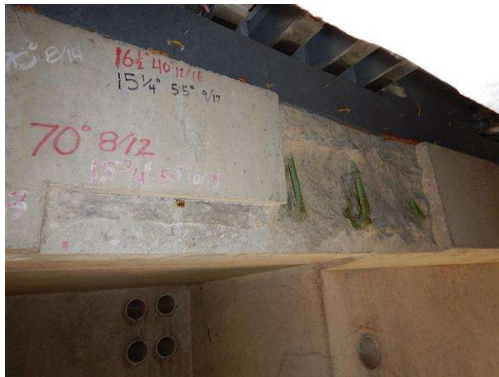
Spalls with exposed reinforcement at the expansion joint at Pier 26NB
